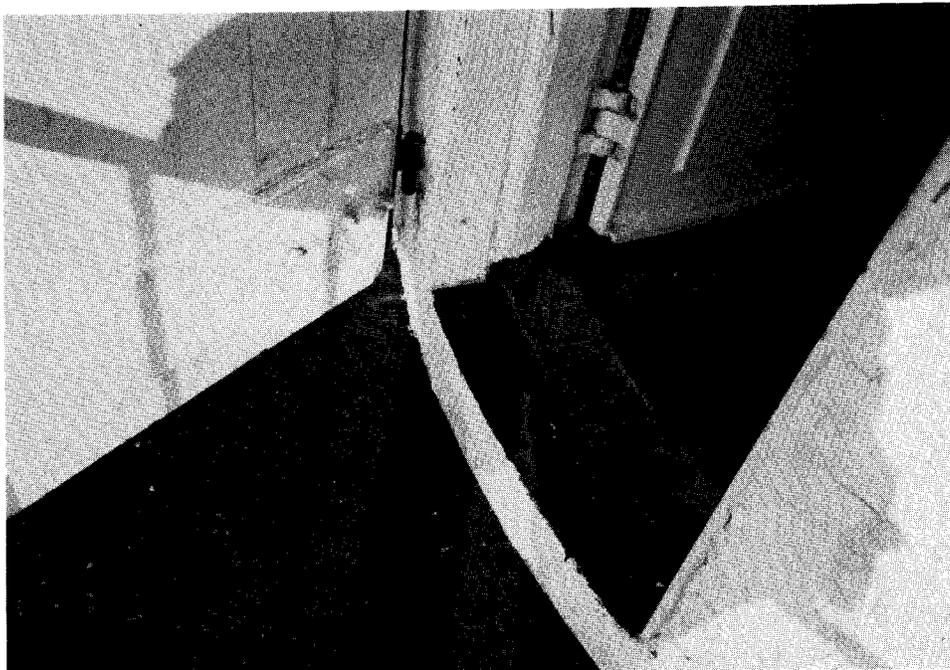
Tower, sill of doorway from Watch Gallery into Watch Deck.
